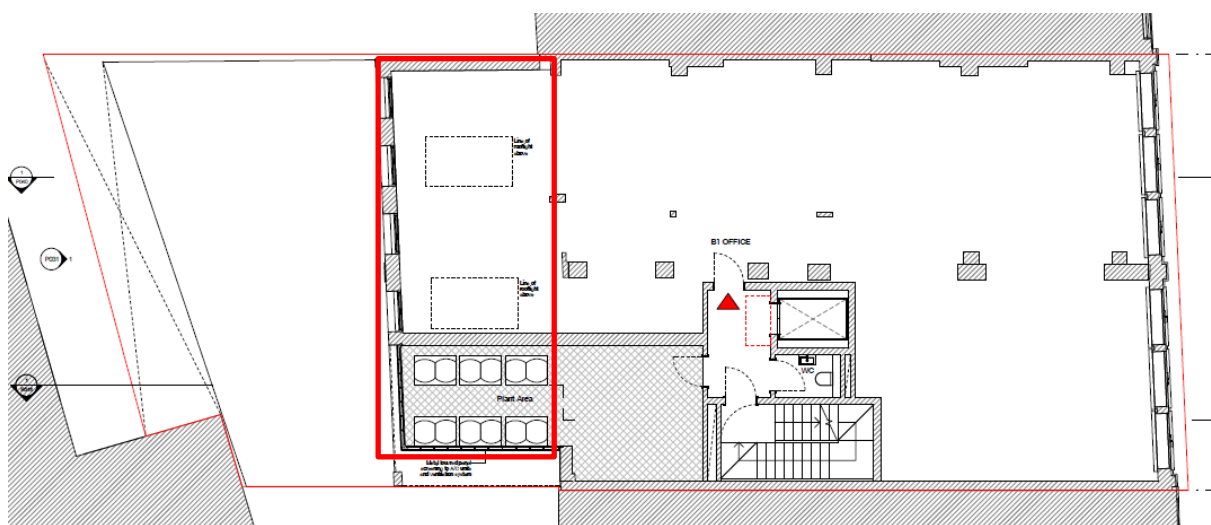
floorplan showing the extent of the third floor extension including plant enclosure
